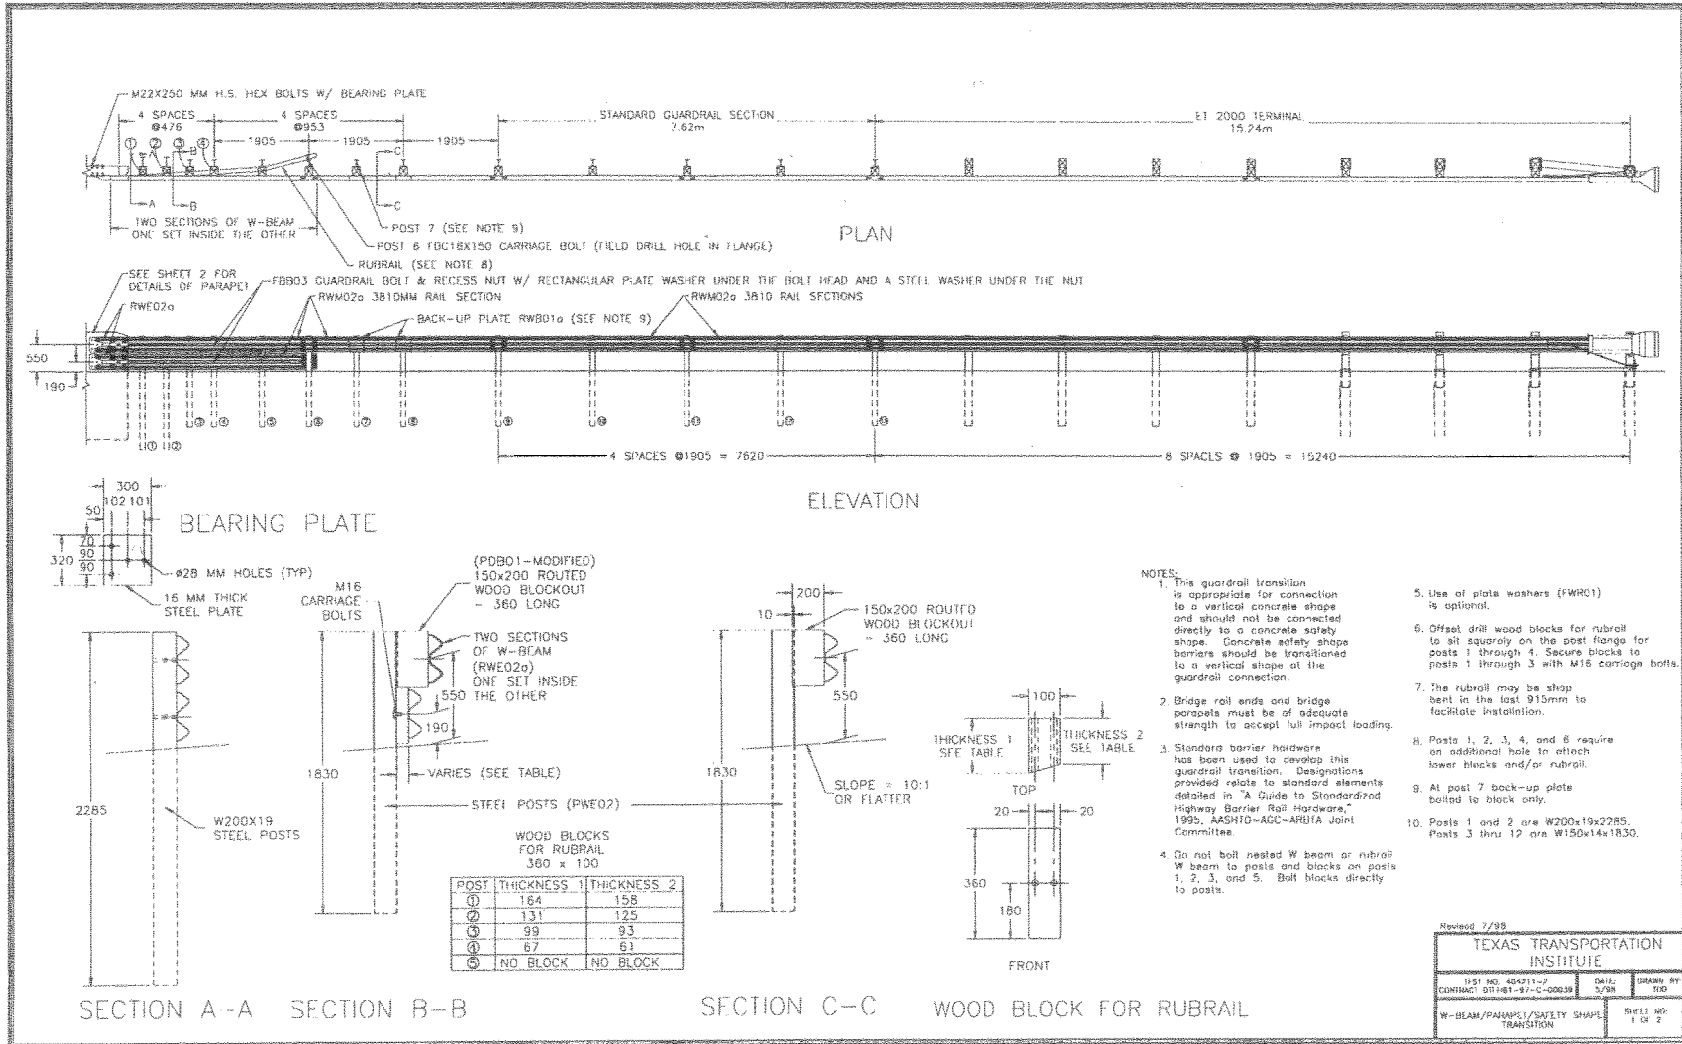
Details of the transition and layout of the installation for test 404211-2.
